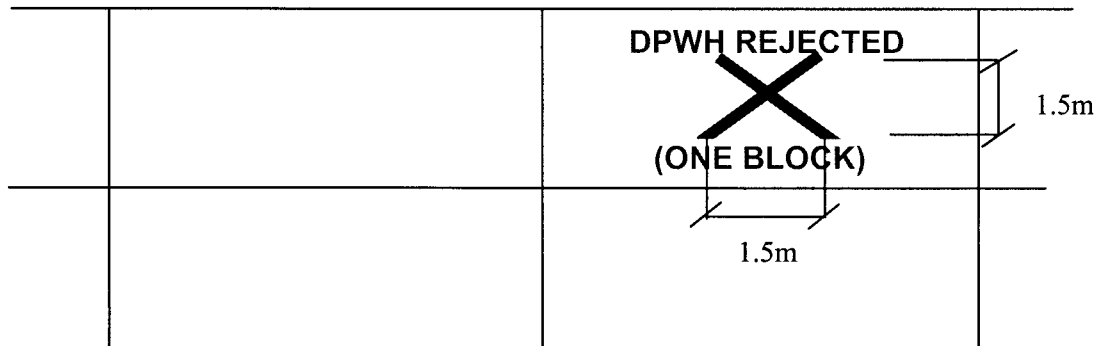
In the case of concrete pavement, indicate number of blocks rejected.
